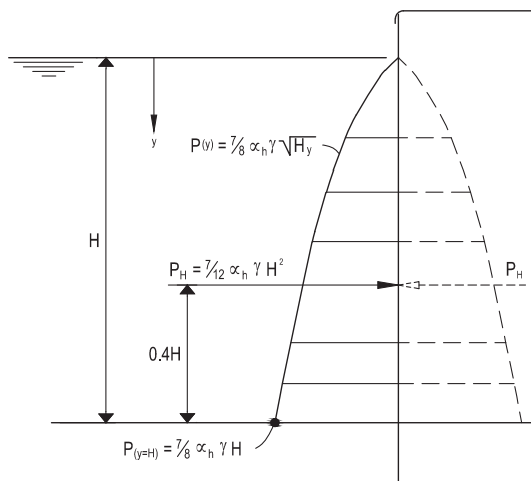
Earthquake-induced hydrostatic pressure on vertical wall caused by added mass of water
